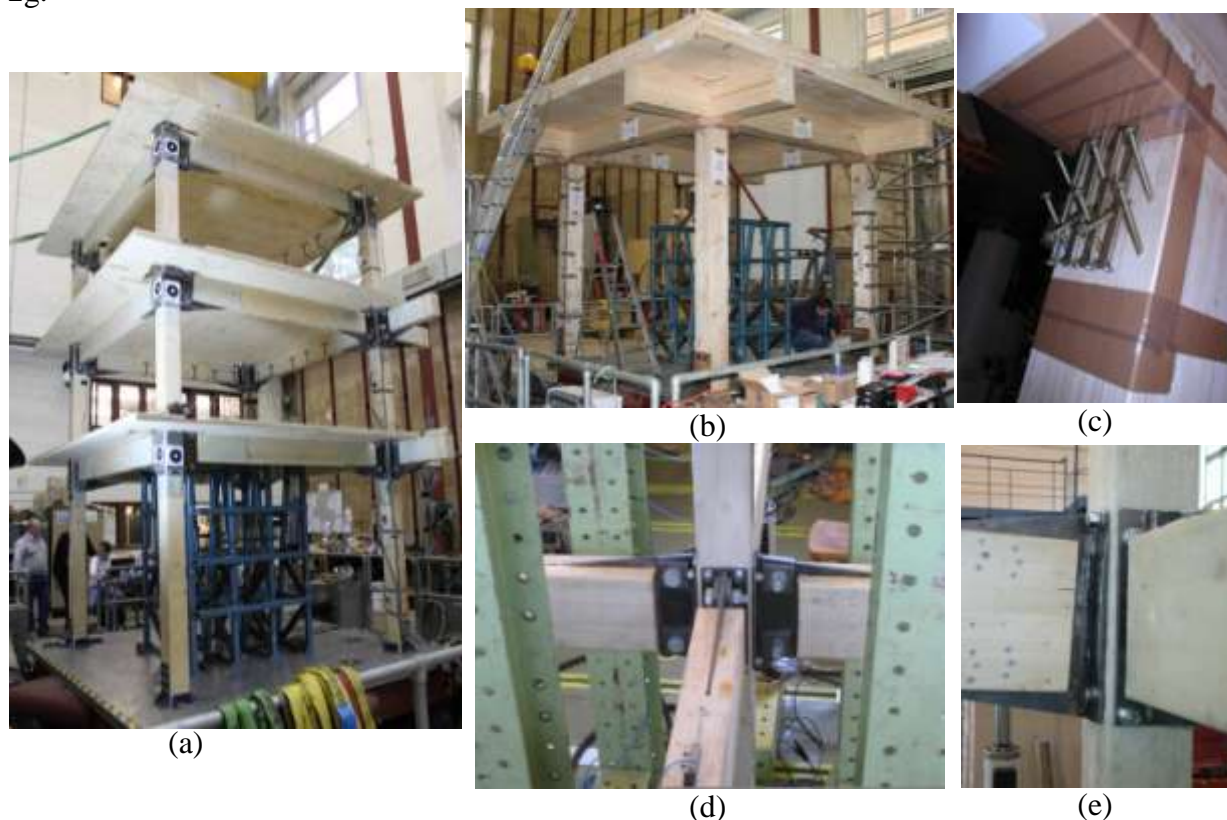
(a) 3-storey 1:3 scaled model on shake table; (b) full-scale one-storey test frame; (c) rigid beam-column connection with self-tapping screws; (d) beam-column connection with frictional joint in preliminary 3D cyclic test; (e) connection as in (d) but without the frictional joint.
